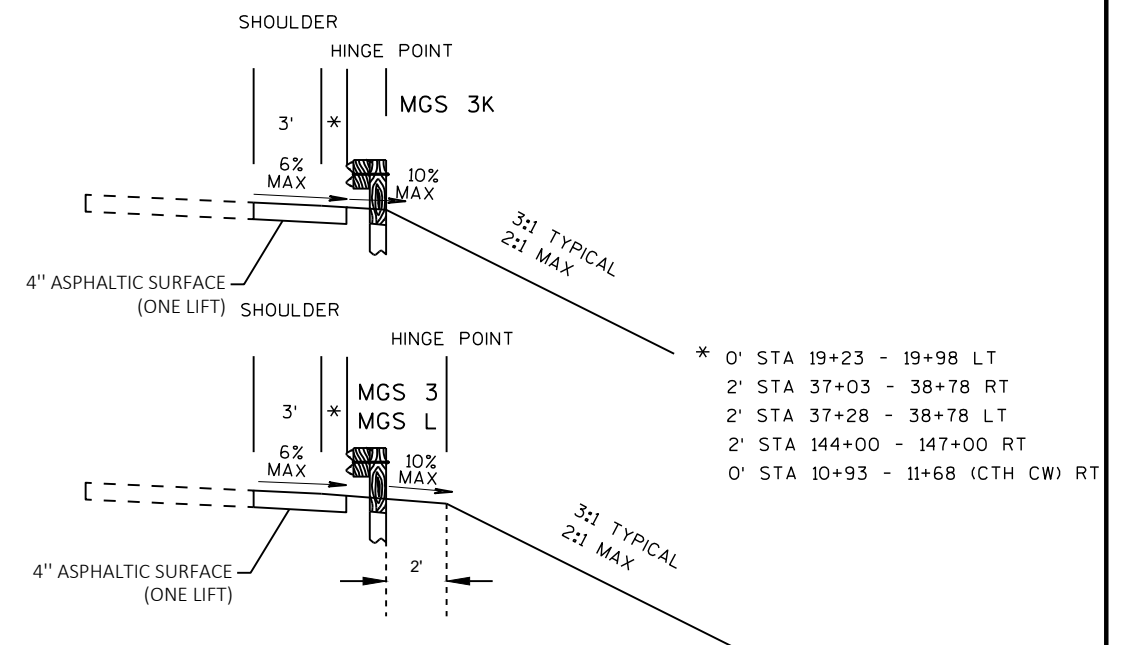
DETAIL FOR ASPHALTIC SHOULDER AT BEAM GUARD
